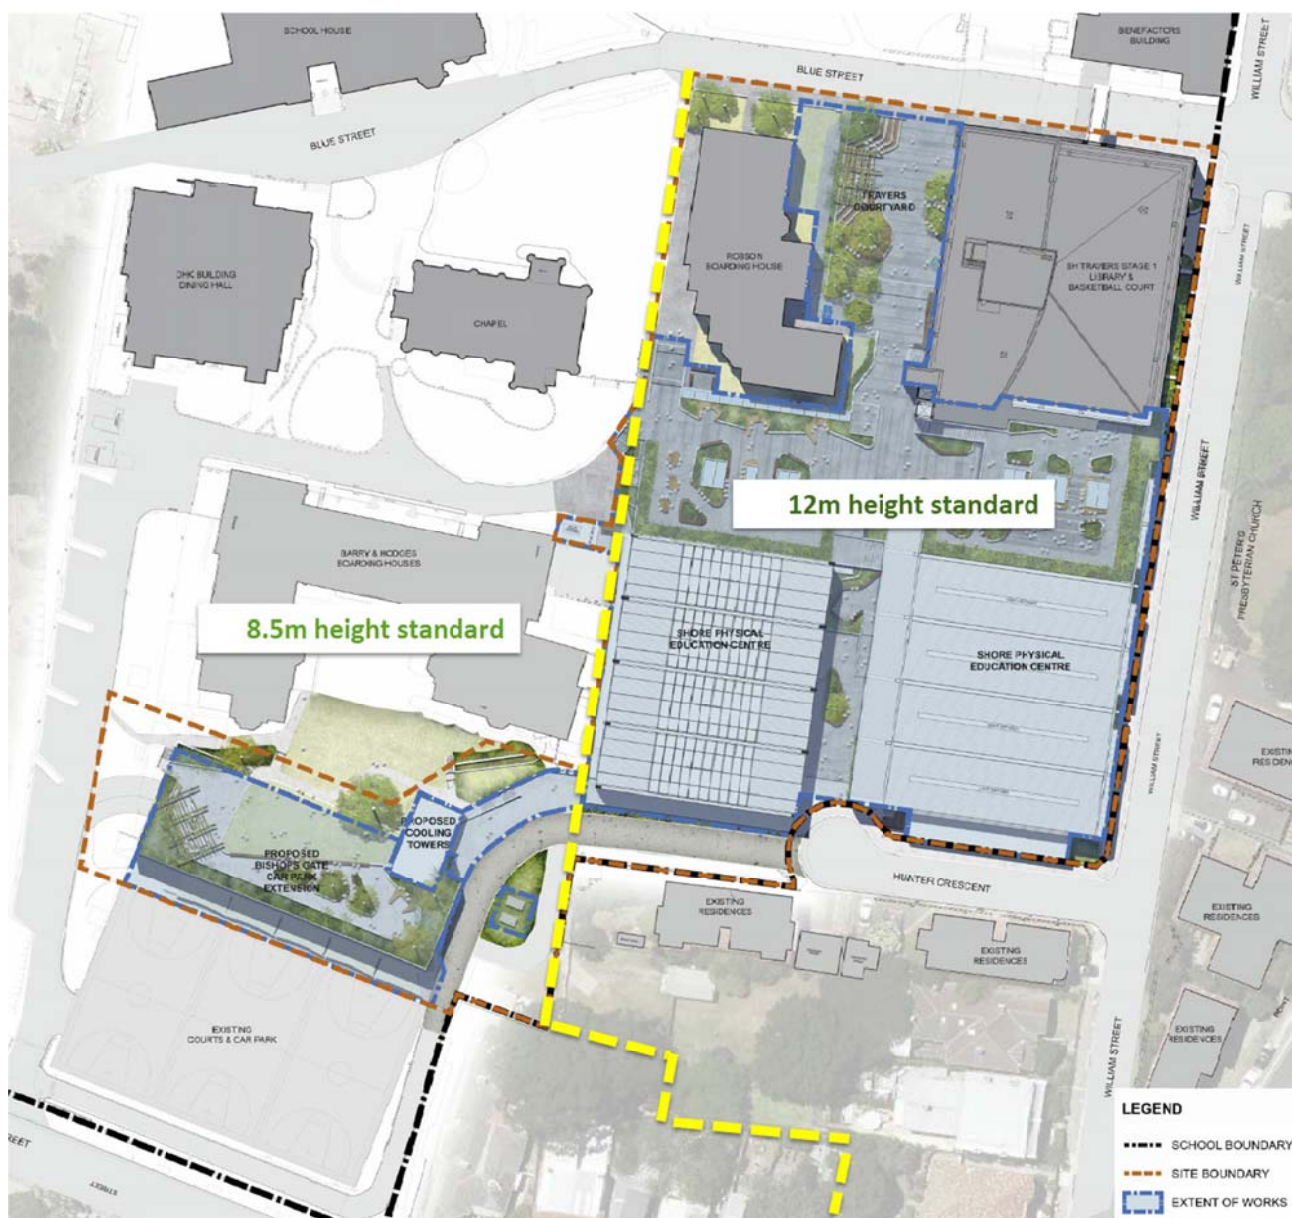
Proposed SPEC site plan showing 8.5m and 12m height of building standards (Source: Cox Richardson, mark-up of A-DA-0012)
